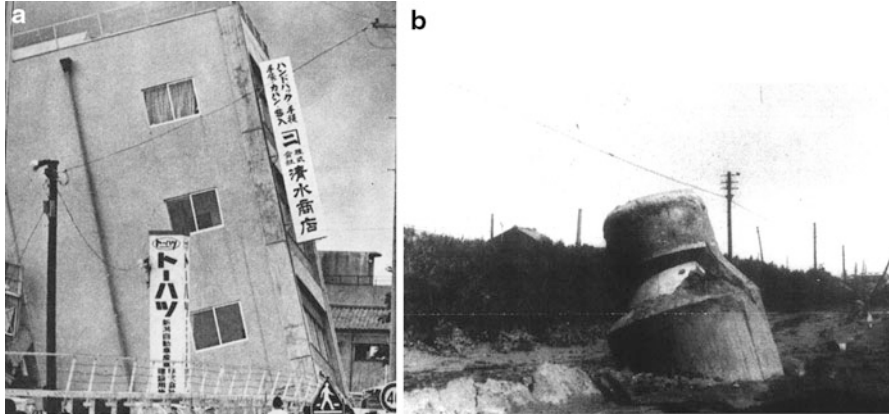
Liquefaction-caused damage (1964 Niigata earthquake). (a) Inclination and subsidence of a three-story RC building. (b) Uplift of sewage manhole
